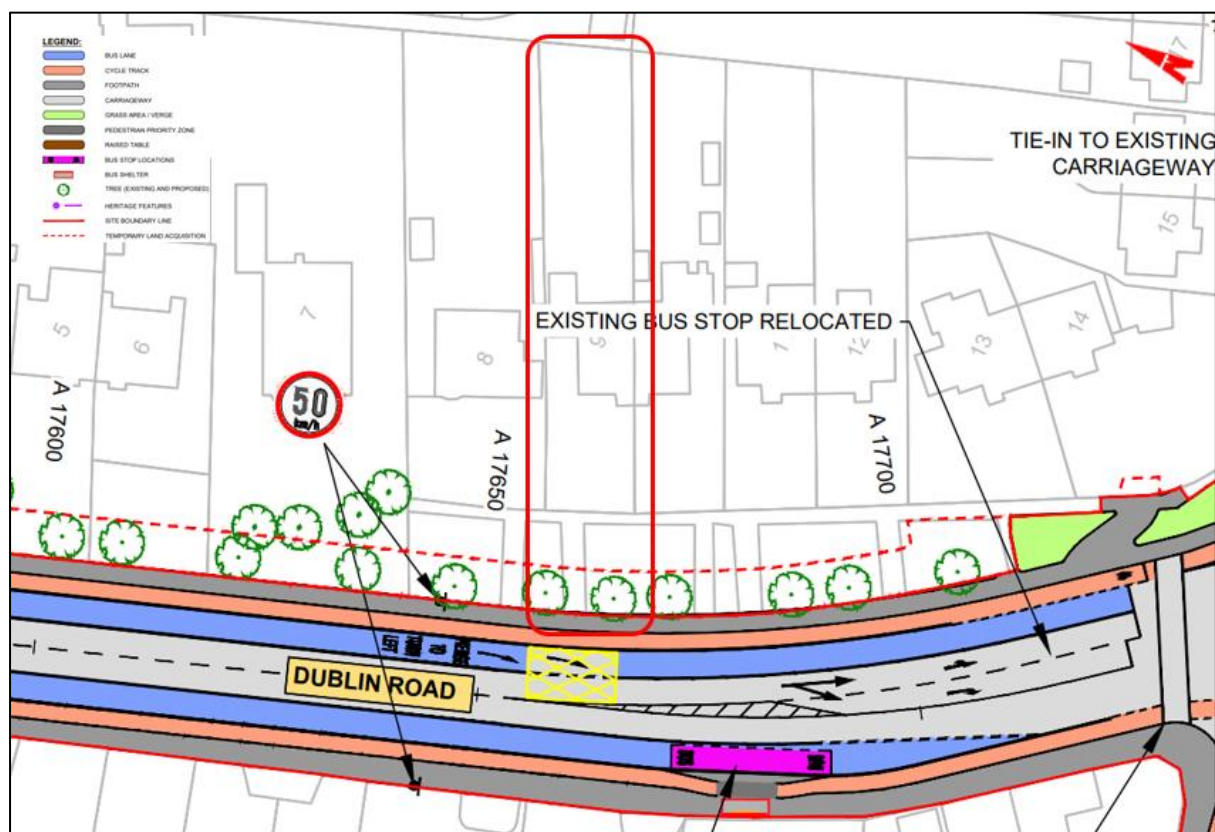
Extract from General Arrangement Drawing at Dublin Road (Sheet 50)
